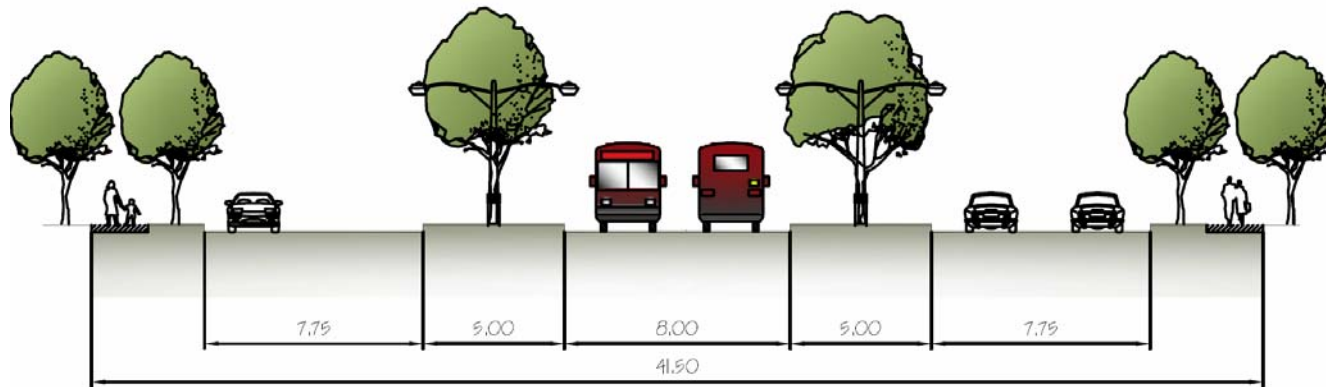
Cross-Section for 41.5m Arterial Road/Transit Corridor
